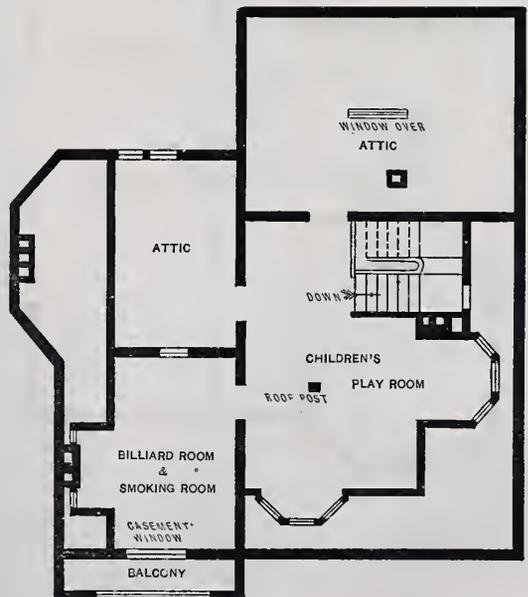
Attic Plan.—Scale, 1-16 Inch to the Foot.
